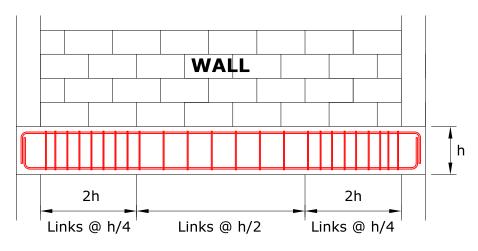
LINK SPACING FOR REINFORCED CONCRETE SUSPENDED BEAM
